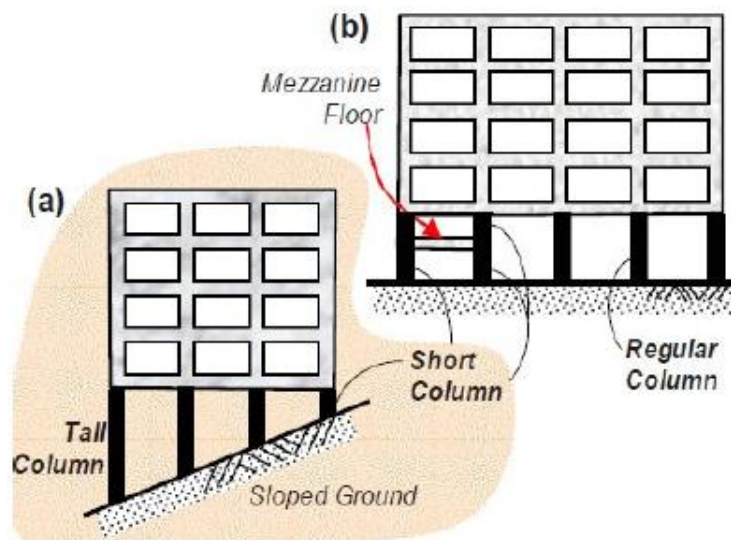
Structures with short columns due to: a) Sloped ground b) Mezzanine floor (Alqatamin and Talpos, 2009)
